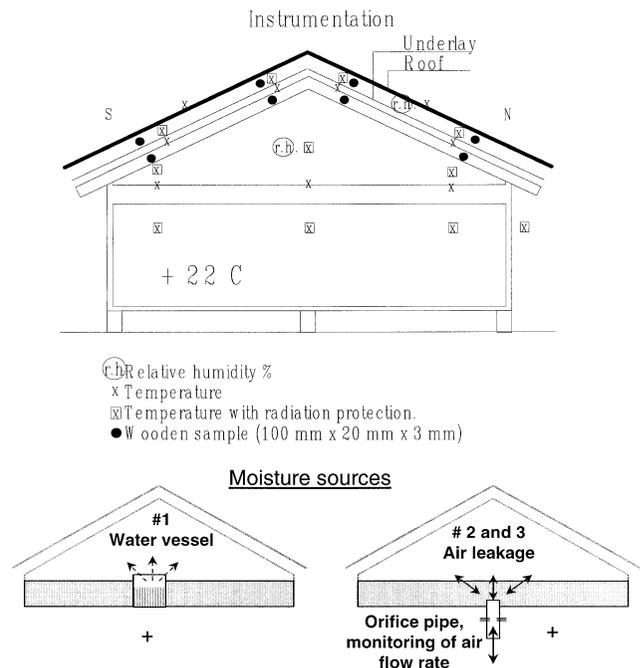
Instrumentation of the test roofs (upper) and moisture load mechanisms used in the experiments (lower). Moisture content of the wooden roof truss was measured at four points in each roof section. Water vessel open from above to the lower airspace (lower, left) was used in test period 1, and controlled air leakage through similar orifice pipes in each roof section (right) was used in test periods 2 and 3.
